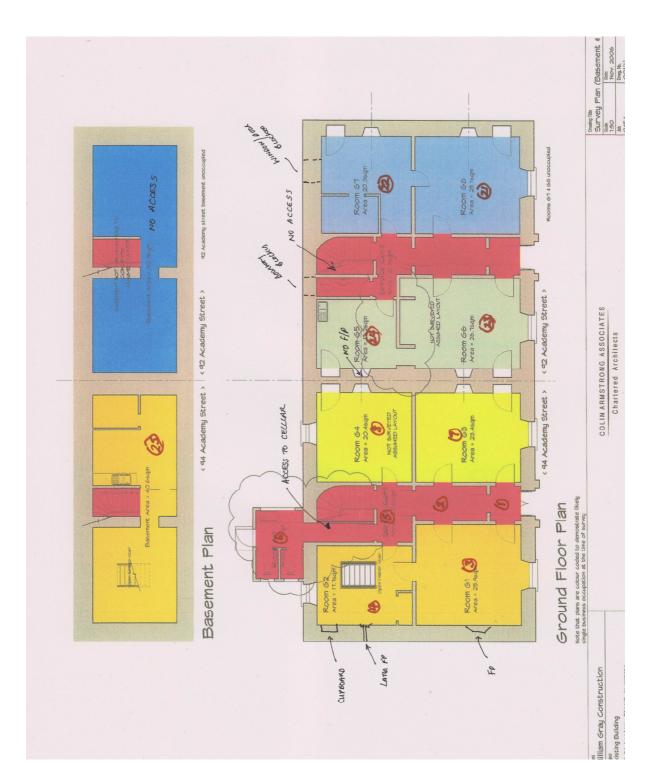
Plans (Altered upon Survey) © Colin Armstrong Architects. (Room Numbers in Red relate to Text)
